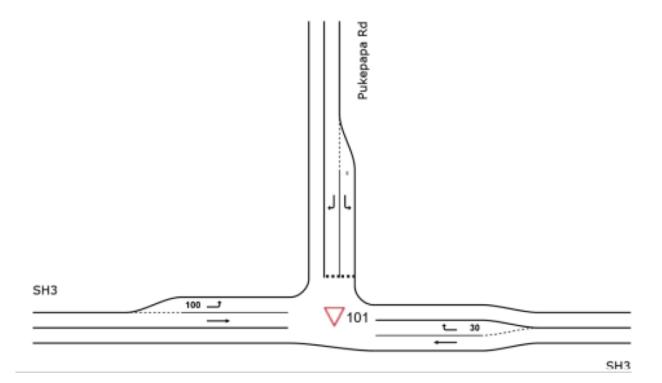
Pukepapa Road / SH3 SIDRA Intersection Layout
